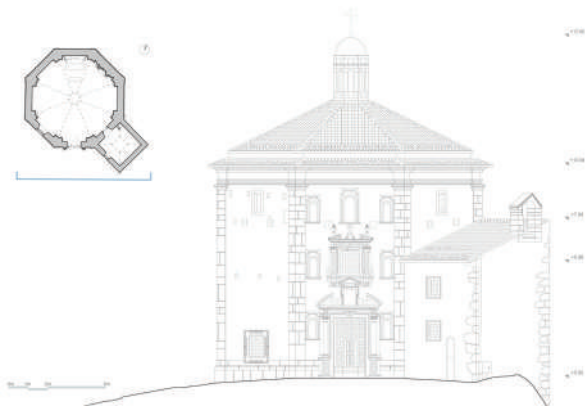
Elevation of the main facade of Madonna della Pietà. Top left the ground floor plan. Drawing by Luca Cetra.
